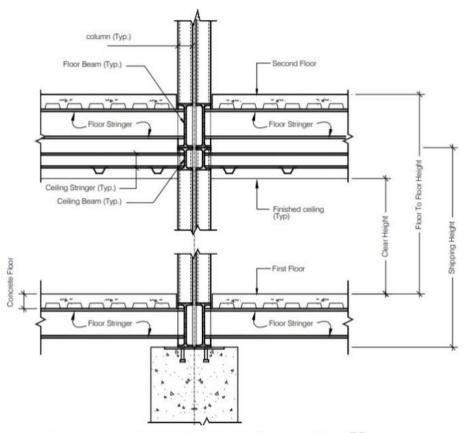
A section of a typical modular floor assembly, retrieved from [36]
